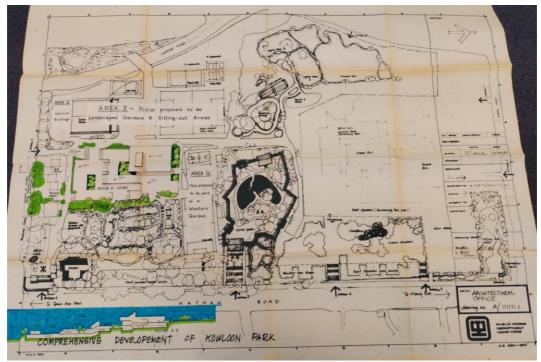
Comprehensive Development of Kowloon Park, Drawing No. A/ 111171A, prepared by Architectural Office, Public Works Department, dated 20 March 1981. This architectural layout plan aligned with the zoning of the 14 areas shown in Figure 2-40. (Source: Extracted from Recreation Select Committee, Capital Works Select Committee, and Museums Select Committee of Urban Council discussion paper, Public Records Office, File No. HKRS 1105-1-9)
